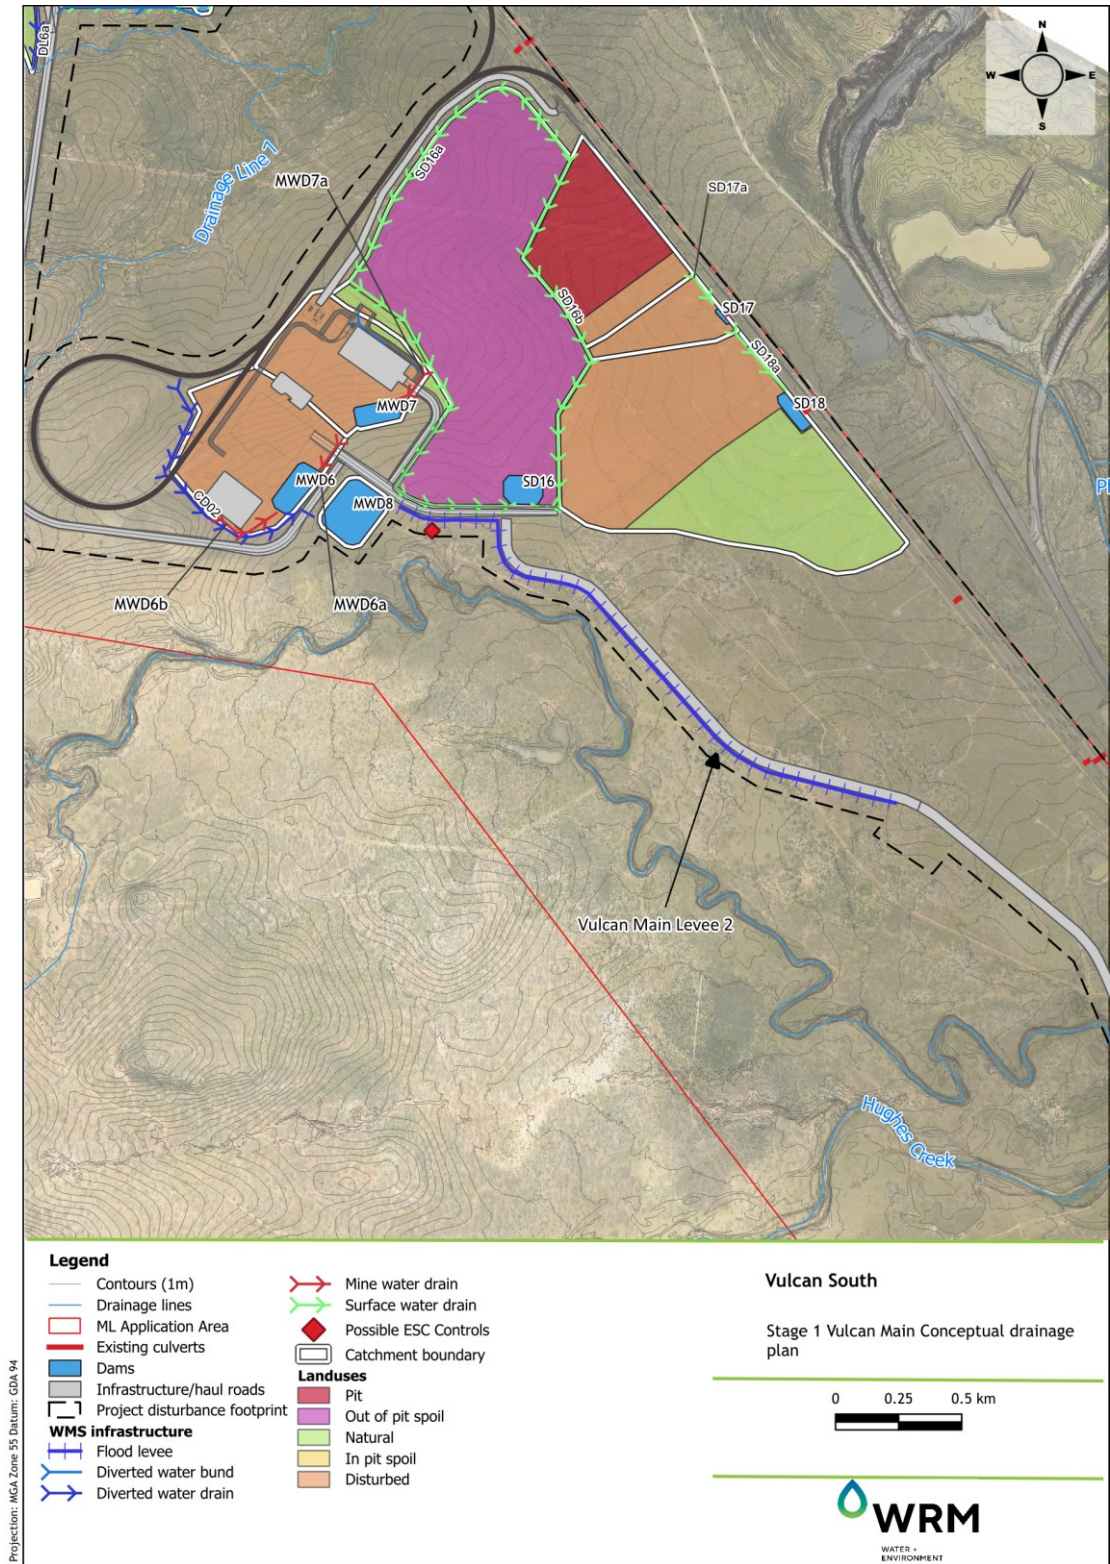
Stage 1 Vulcan Main mining area conceptual drainage plan
